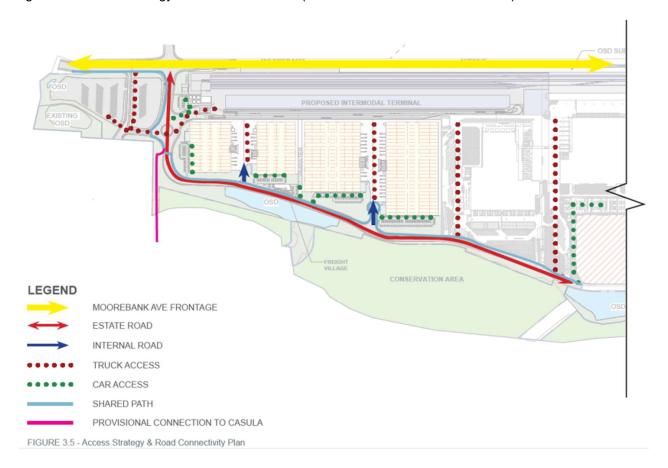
Share cycle and footpath connection to Moorebank Avenue (Source: Approved B2 Plan Rev S- August 2023)
